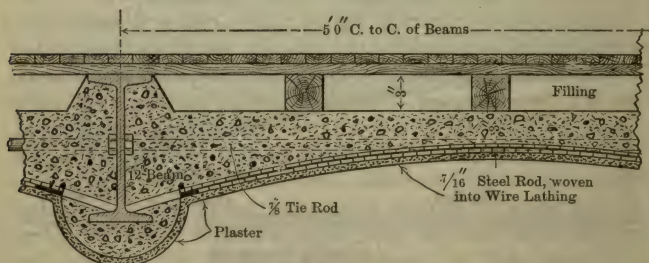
Type 2. Warehouse construction with sleepers depressed.
